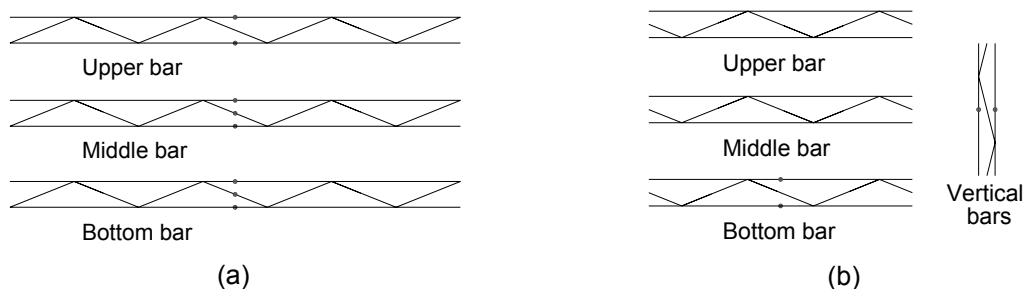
Instrumentation of the reinforcements with strain gauges: (a) four point load tests and (b) three point load tests (dimensions in mm).
